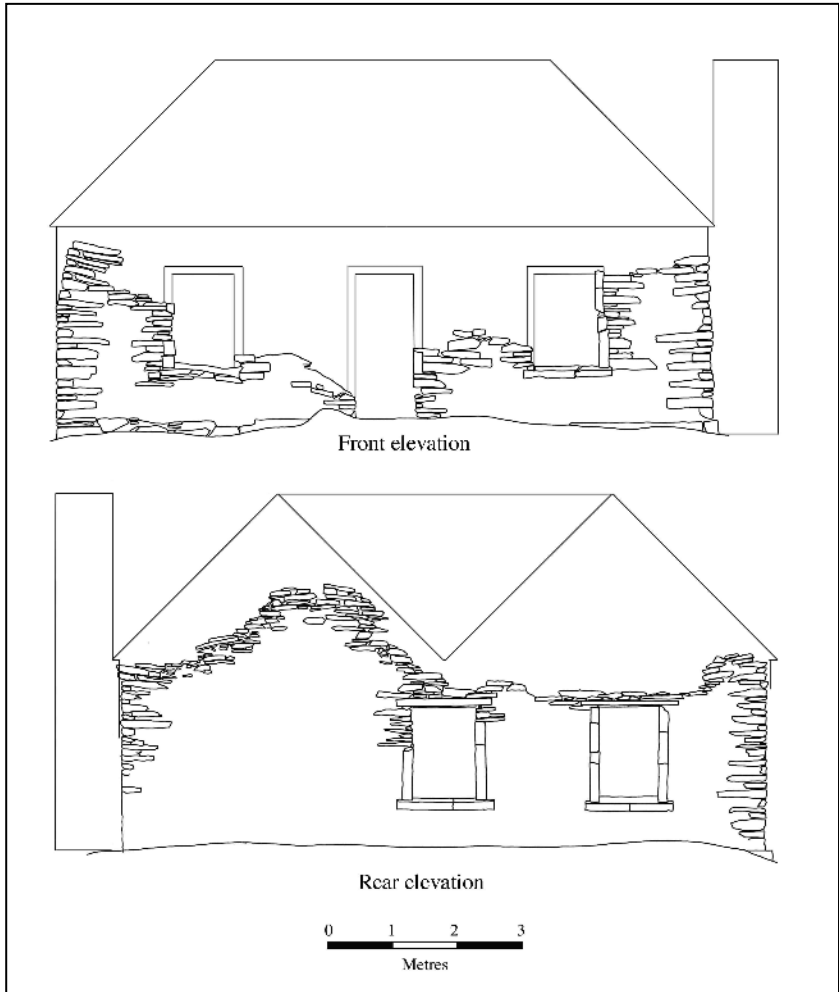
The main front and rear elevations, with the original wall and roof profiles shown
